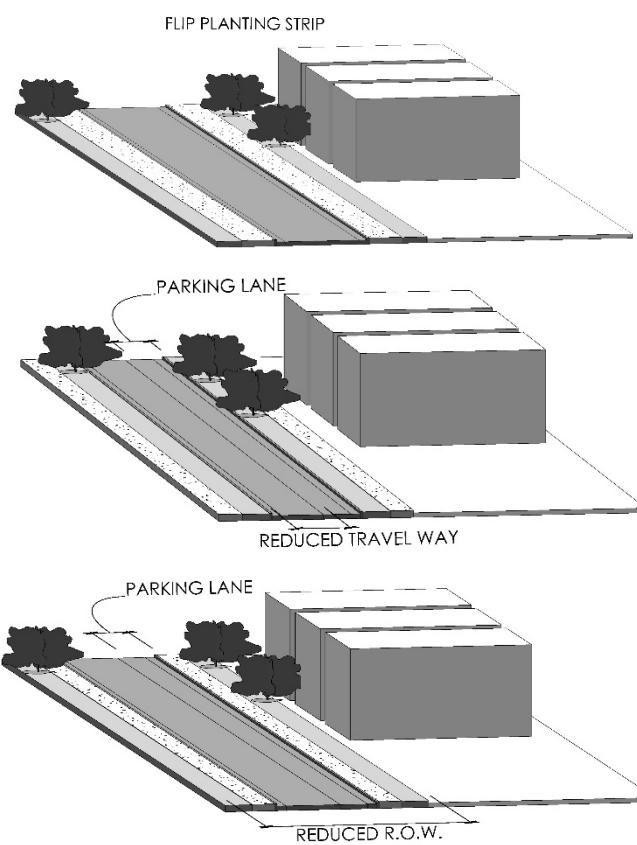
Waiver Diagram Reverse location of the planting strip and the sidewalk provides the perception of larger front yards and increased green space.
